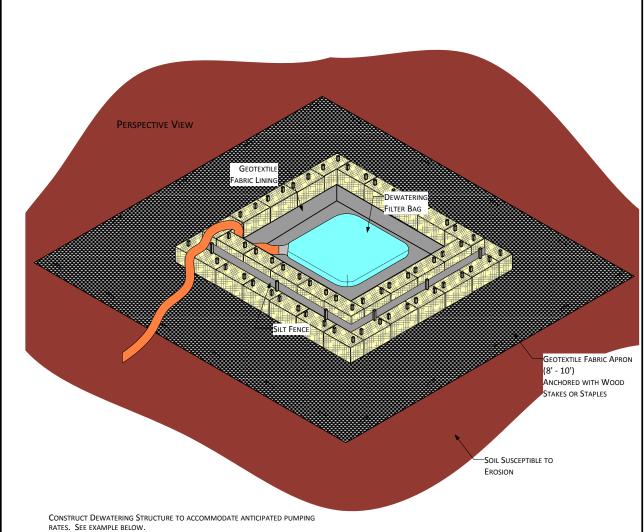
A Environmental Protection Plan Straw Bale Dewatering Structure
